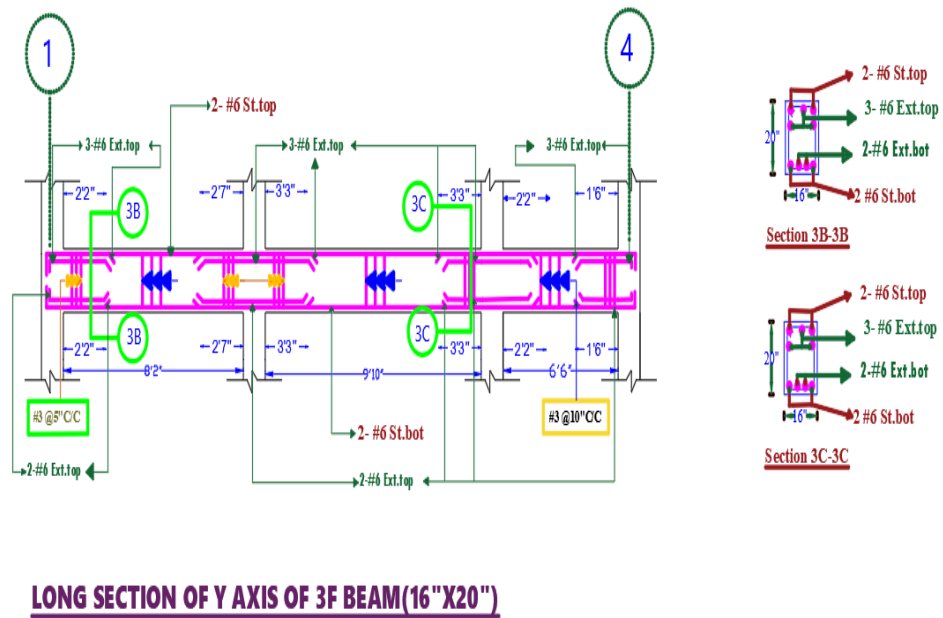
Long and Cross Sections of Y Axis of 3rd Floor Beam (16" X 20")
